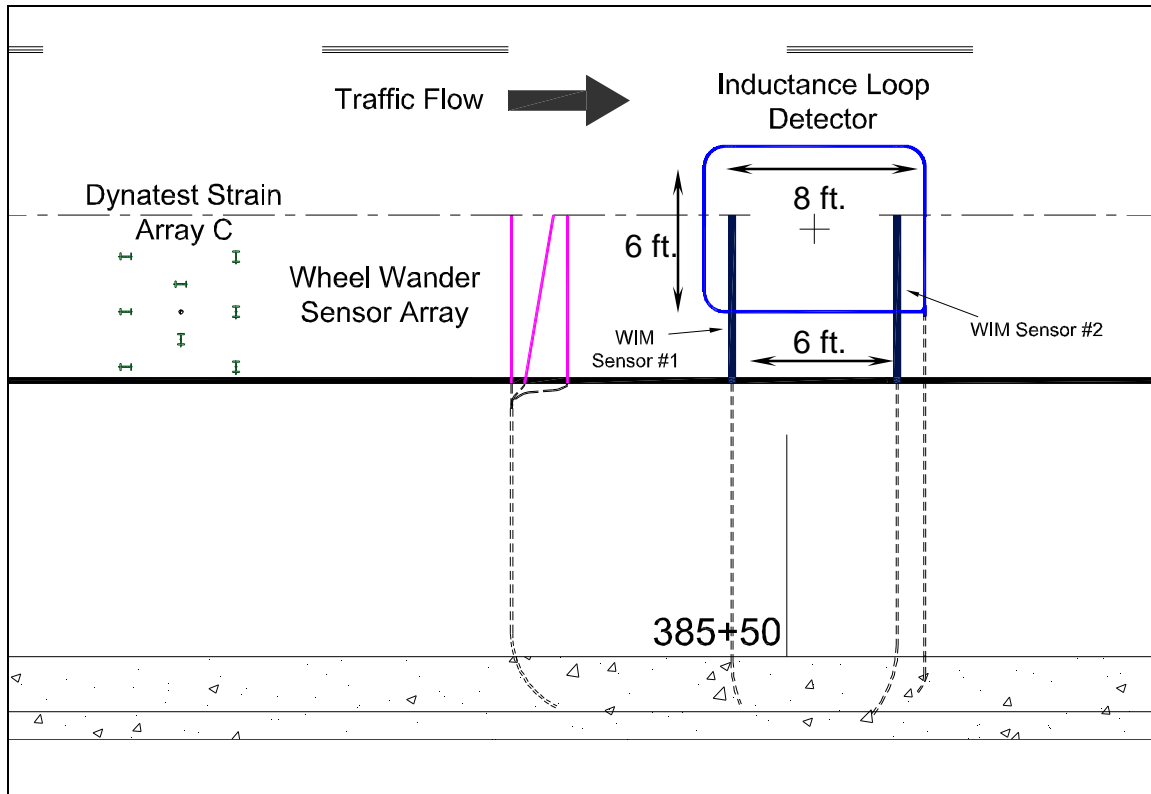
Layout of the WIM sensors (loop detector and two quartz piezo strips) and the wheel wander sensors. The conduits installed into the pavement are also shown as hidden lines extending from the instruments to the curb.
